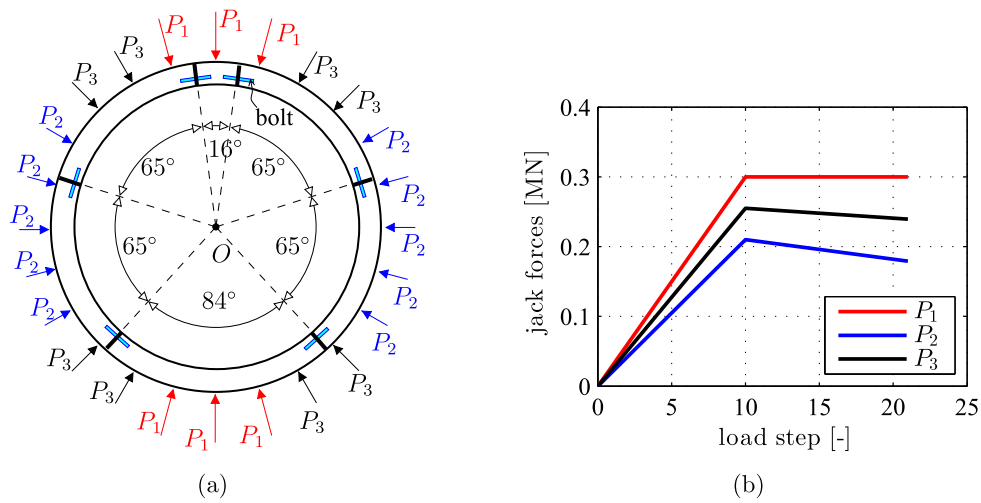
Bearing-capacity test on a segmental tunnel ring (Liu et al., 2016): (a) layout of the hydraulic jacks and (b) imposed jack forces.
